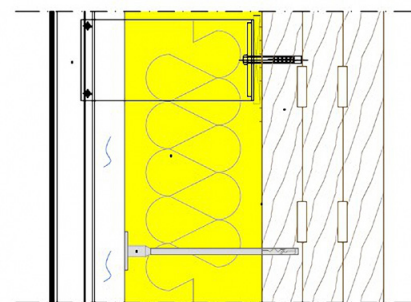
| Perimeter walls in Soligno®180 panels: data sheet, construction detail of the roof, current vertical section on Alucobond ventilated rainscreen.
